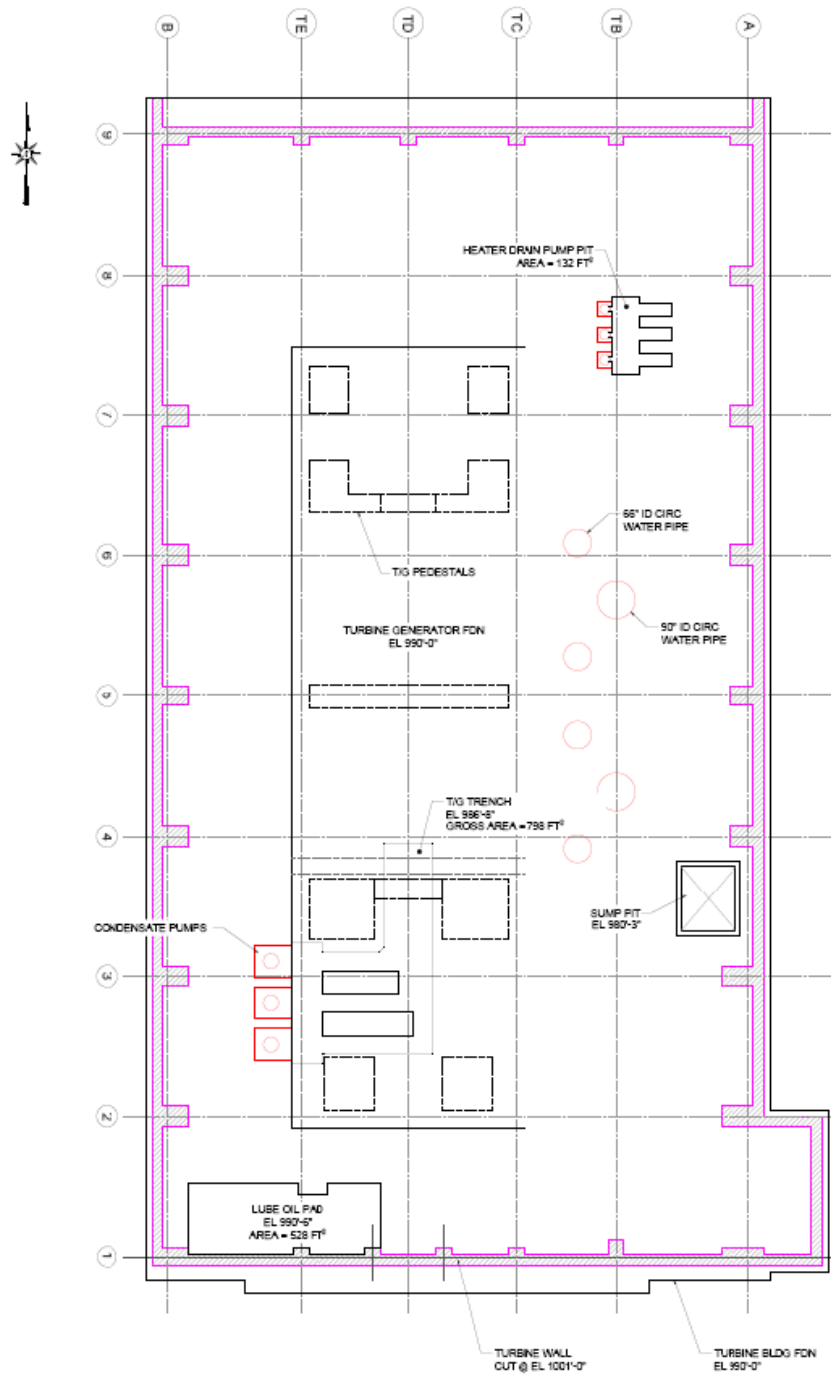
Turbine Basement End State Foundation, Wall Areas, and Pedestal Layout
